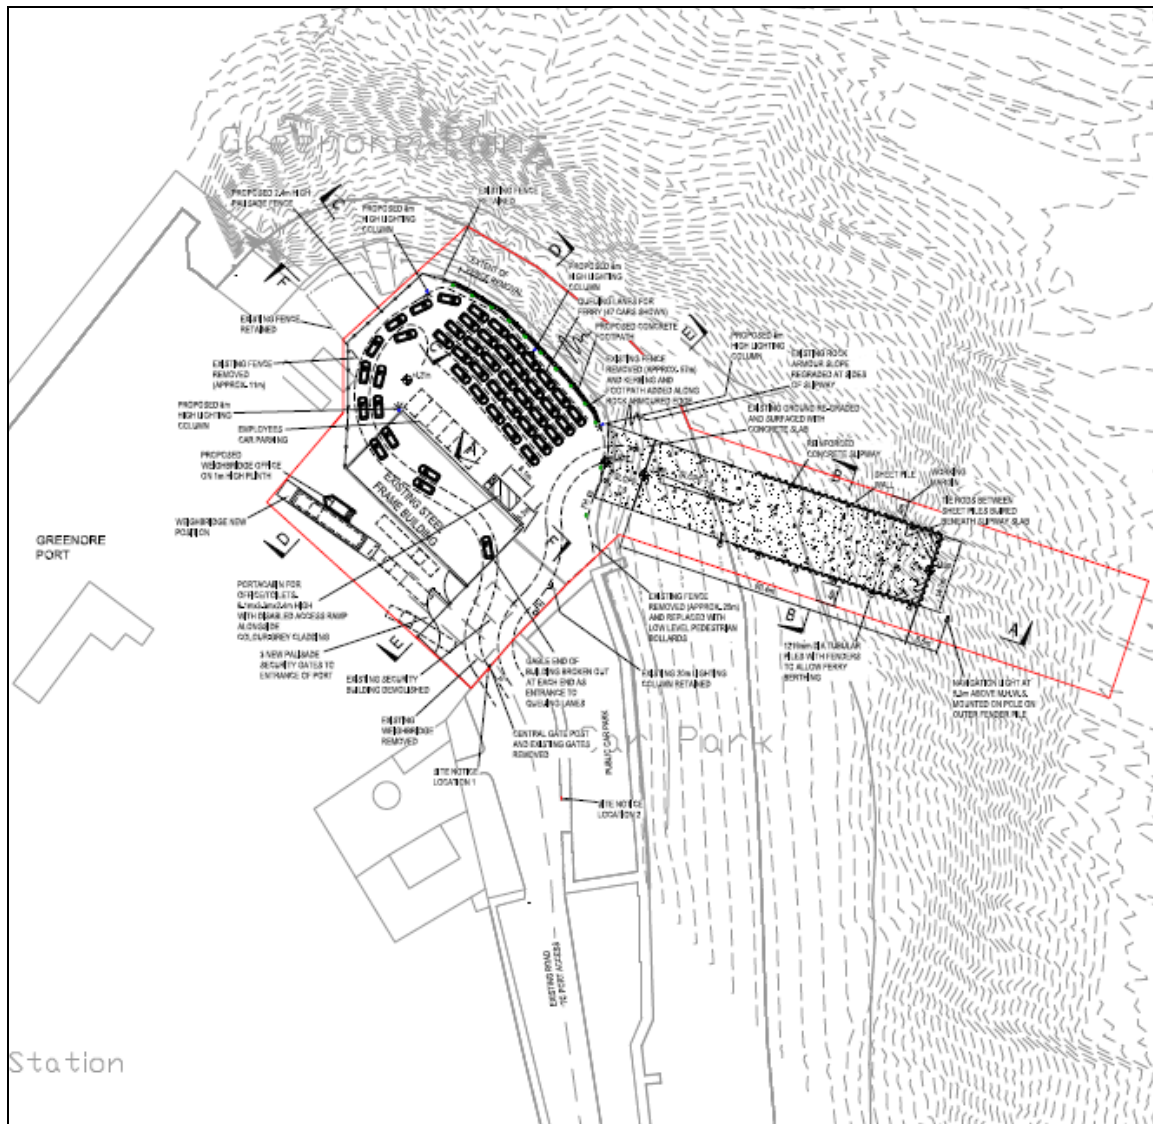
Plan of Proposed Development at Greenore Port, Co. Louth
